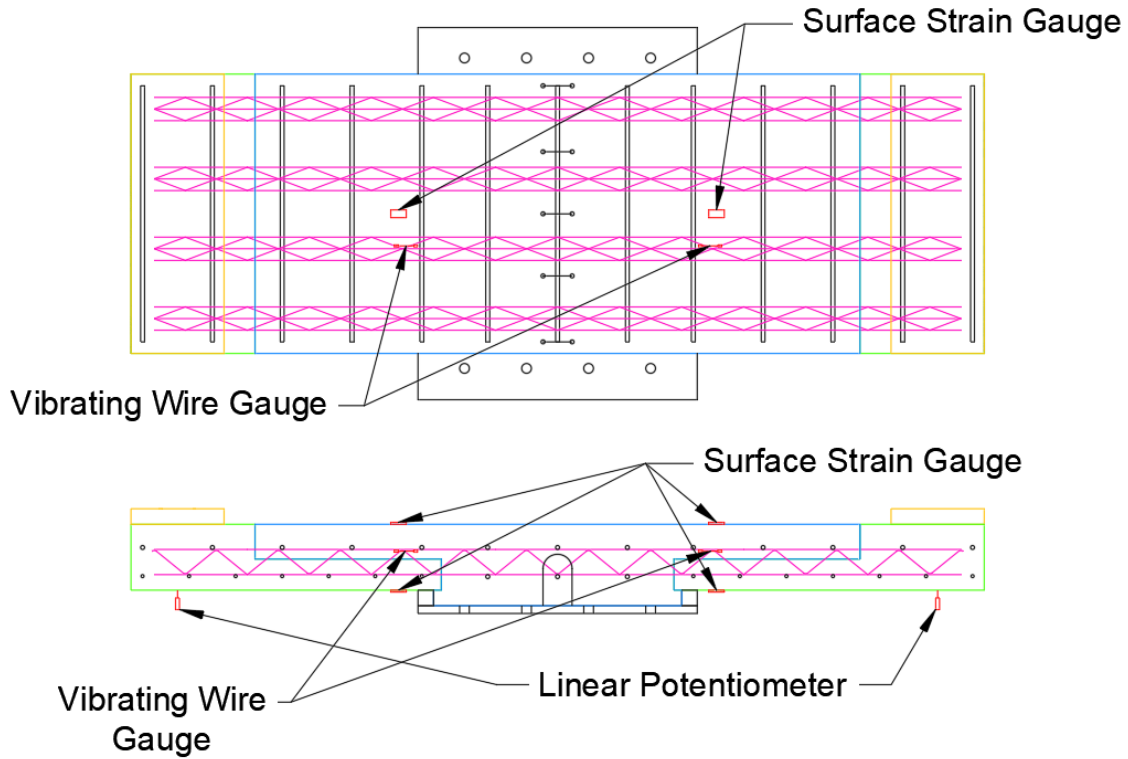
Surface Strain & Vibrating Wire Gauge Sensor Layout (Delamination Sensors Not Shown)
